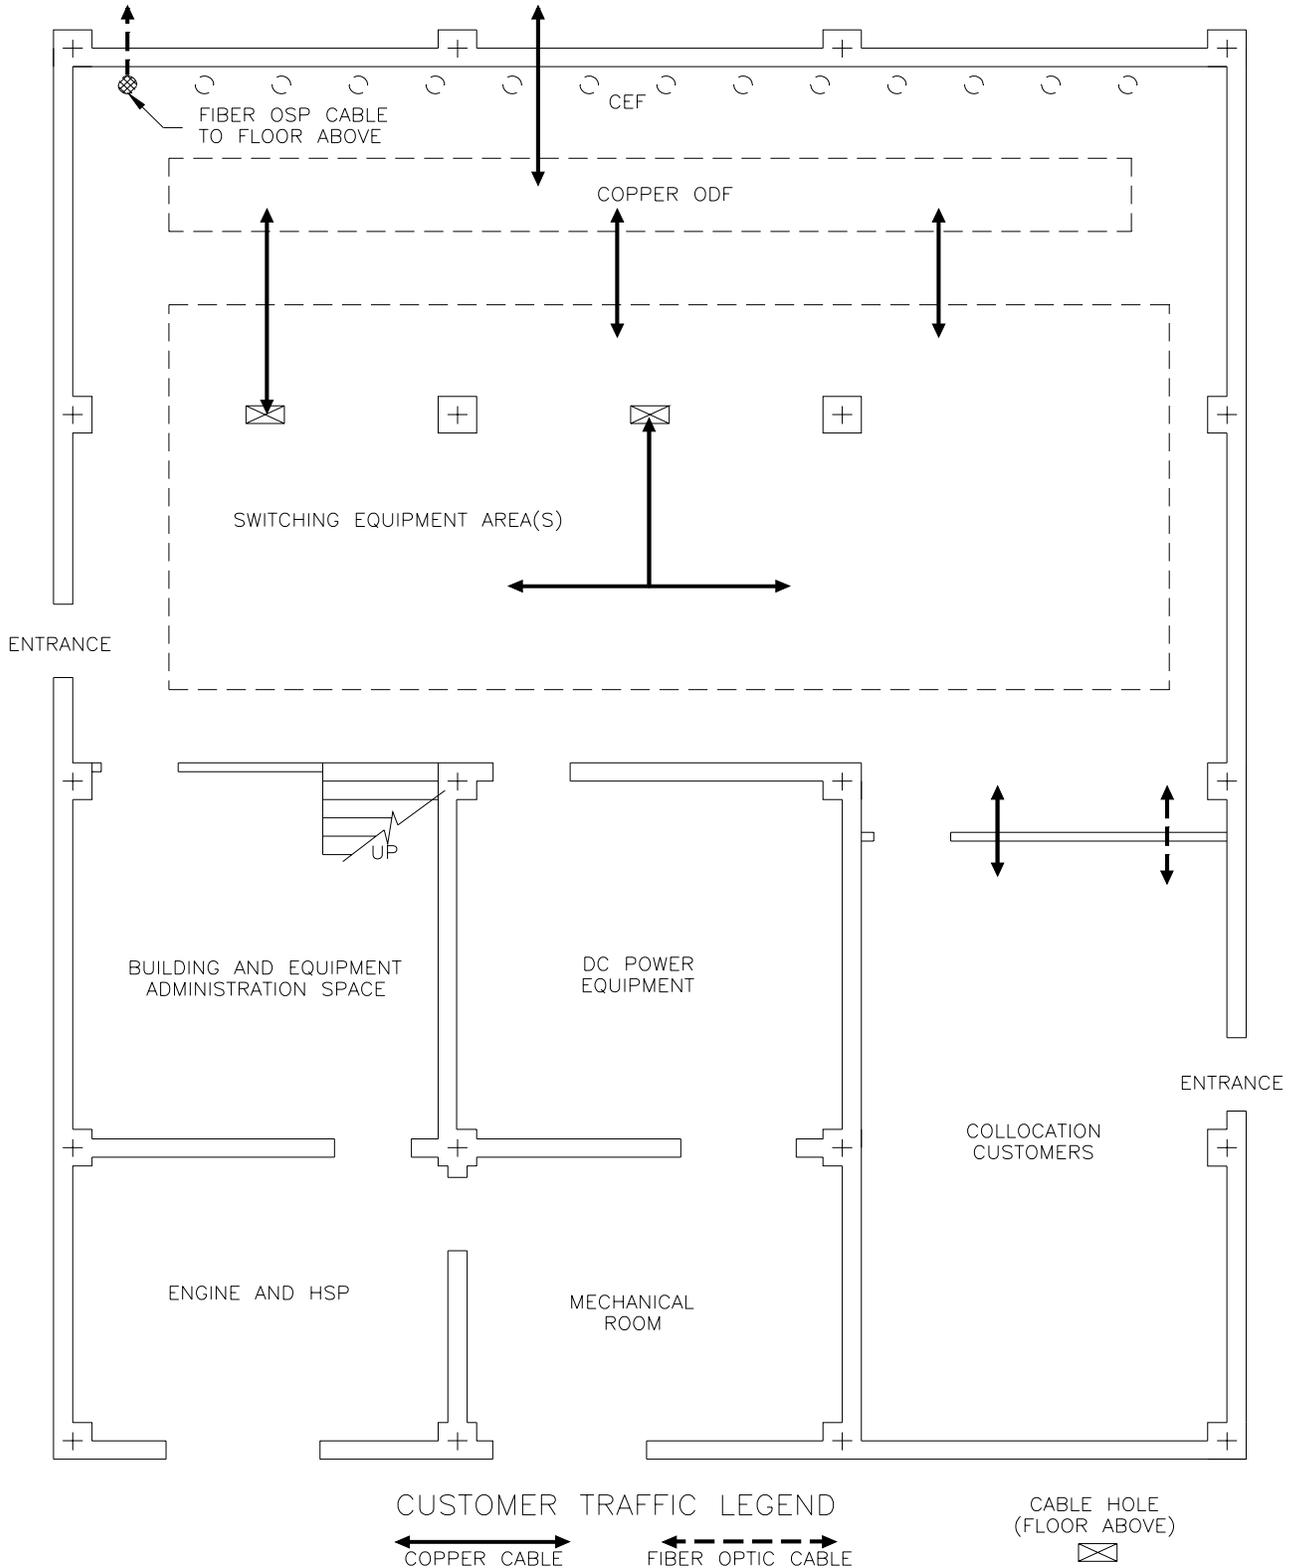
Generic Model Of Single Story Network Equipment Building
